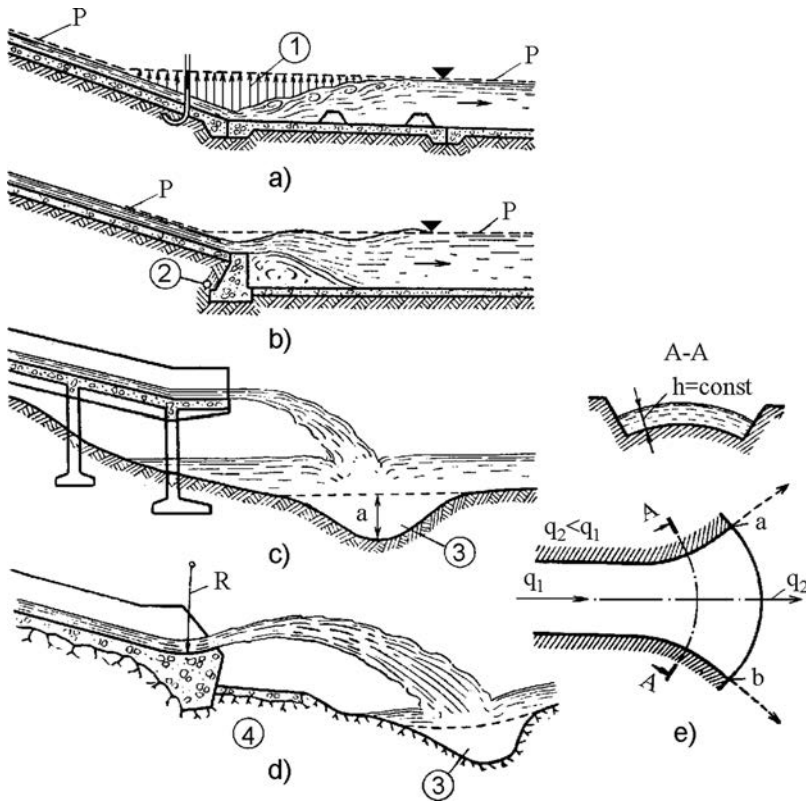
Terminal (end) part of the spillway structure (after Grishin et al., 1979). (a, b) With a stilling basin; (c, d) with a structure for projecting the flow jet. (1) Deficit of pressure; (2) drainage; (3) plunge pool; (4) rock in foundation.
